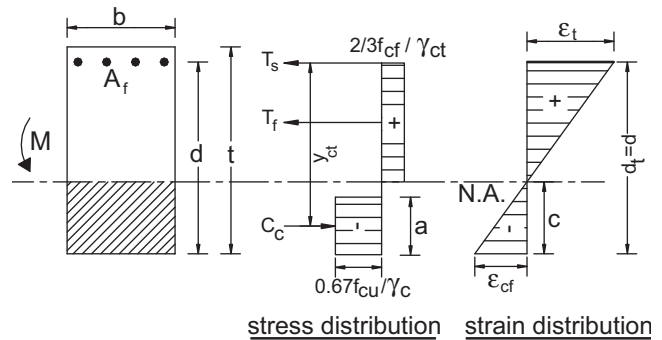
Analytical model for design of fibrous concrete single and double reinforced section.
